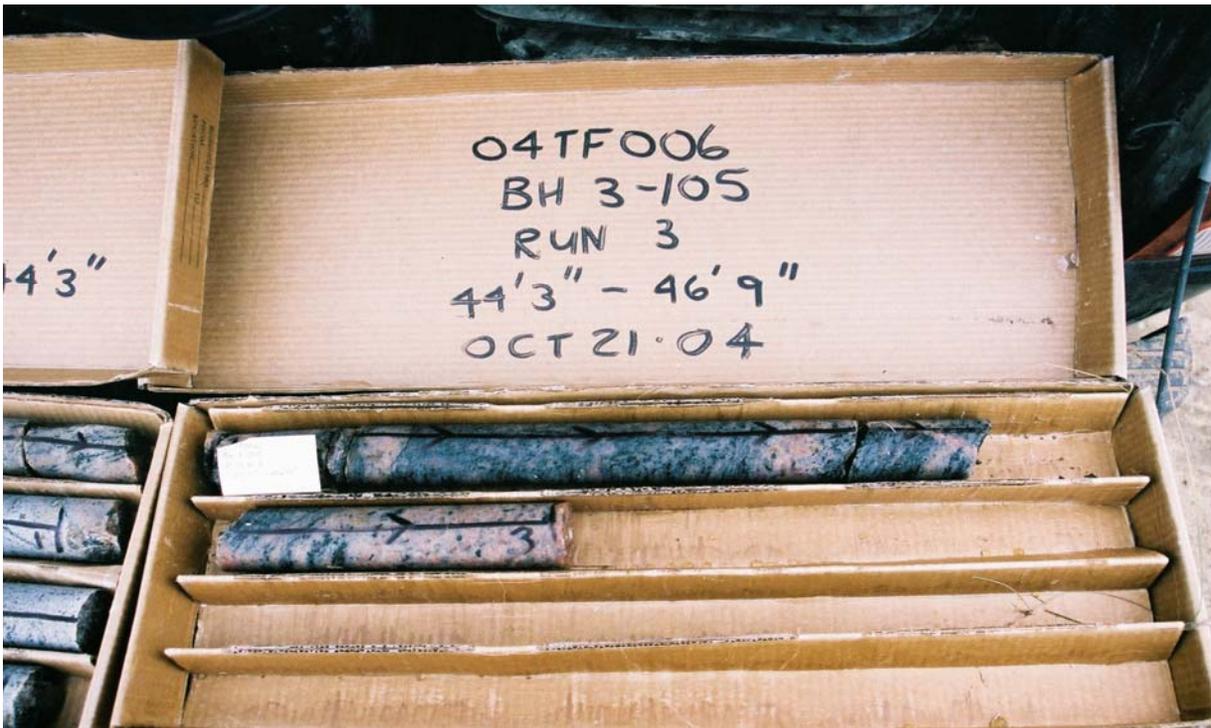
Granitic Gneiss Borehole 3-105, Rock Core 10 at Centre pier (South Mary Lake Road)
